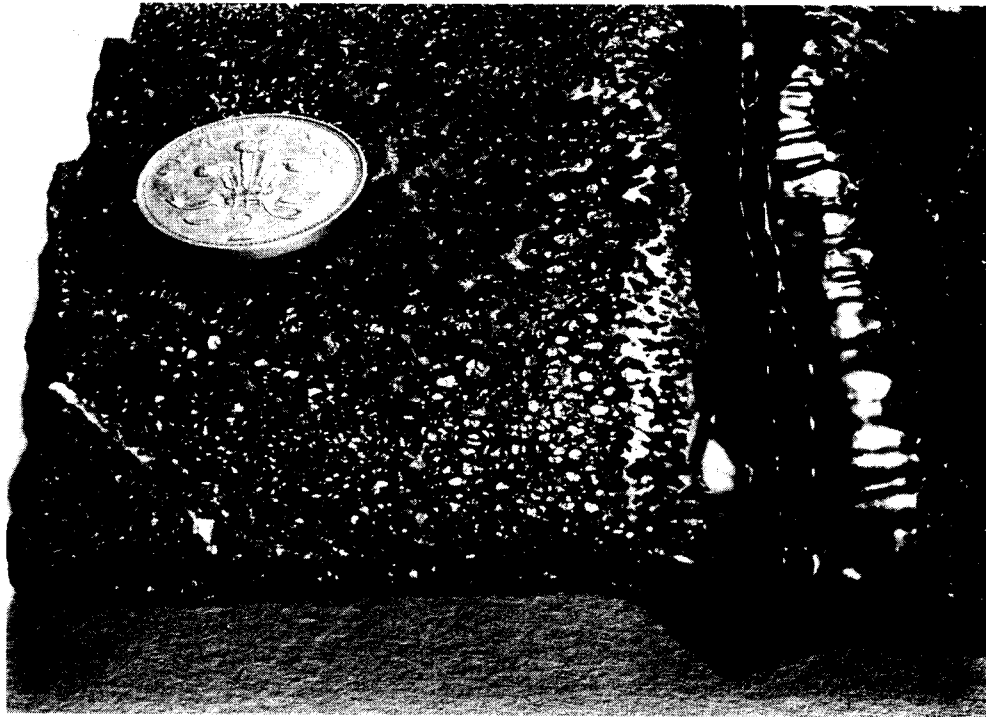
RIDGE ACROSS RUNS OF FELT NEAR PERIMETER OF ROOF. NOTE DIAGONAL JOINT IN INSULATION AT BOTTOM LEFT CORNER AND THICKENING OF BITUMEN. (CASE STUDY 2.2.3)
